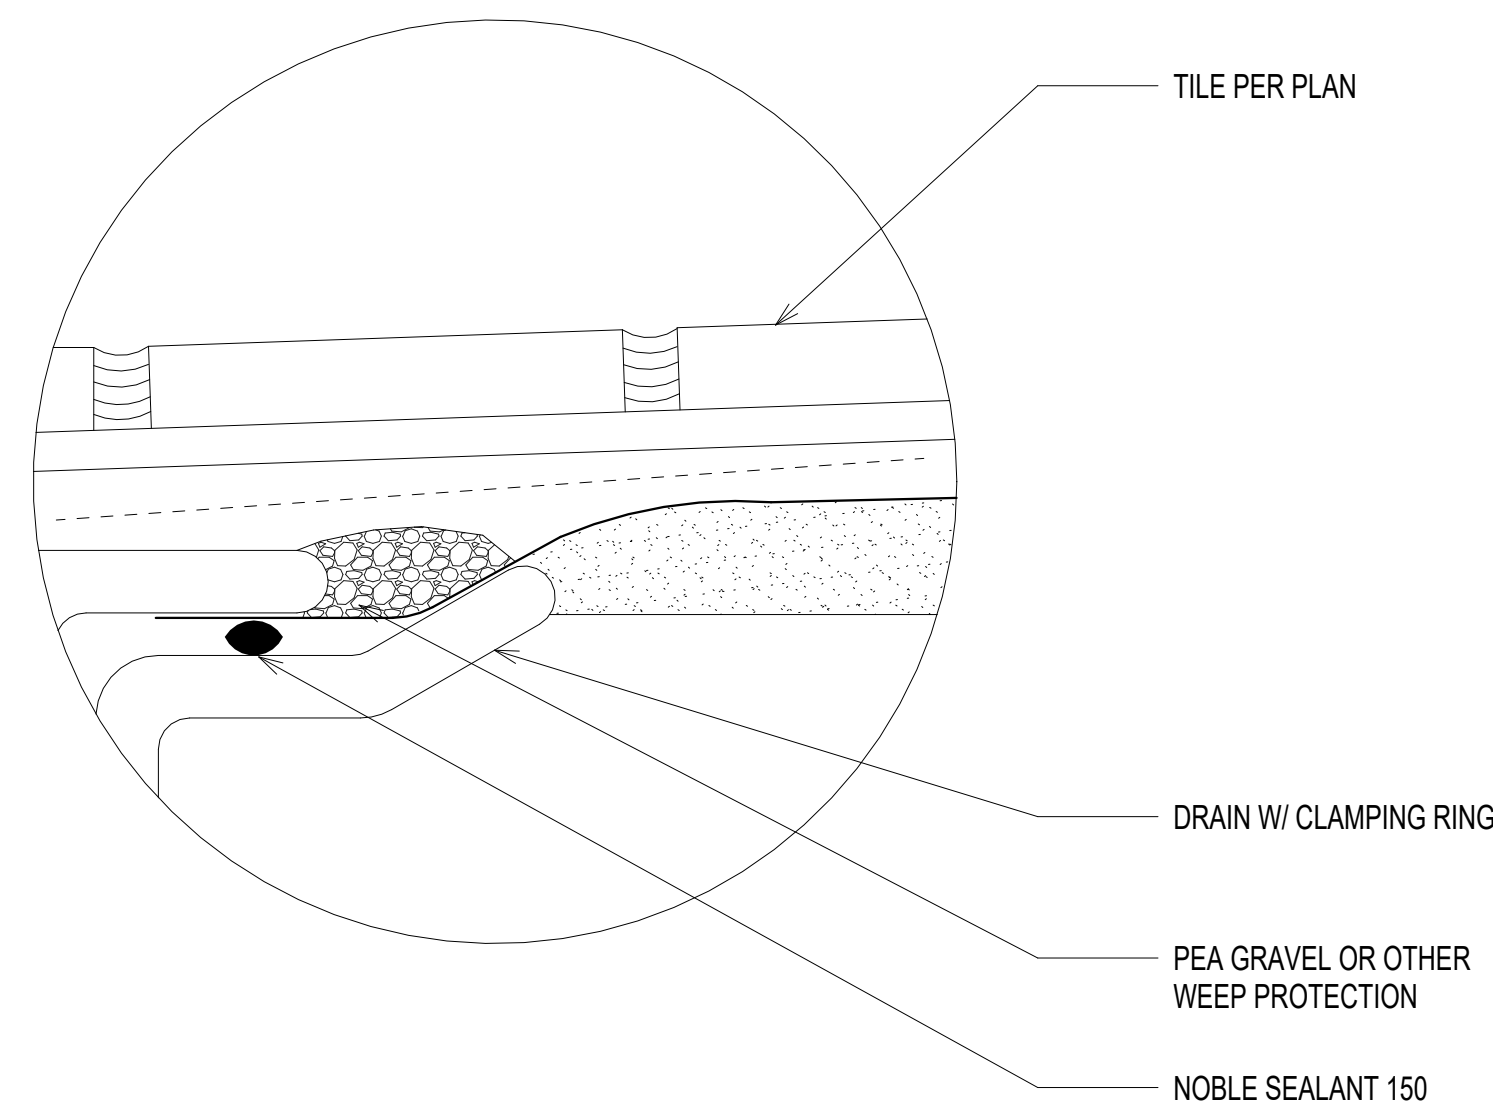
DETAIL - DRAIN / OVERFLOW DRAIN 1" = 1'-0"	10
